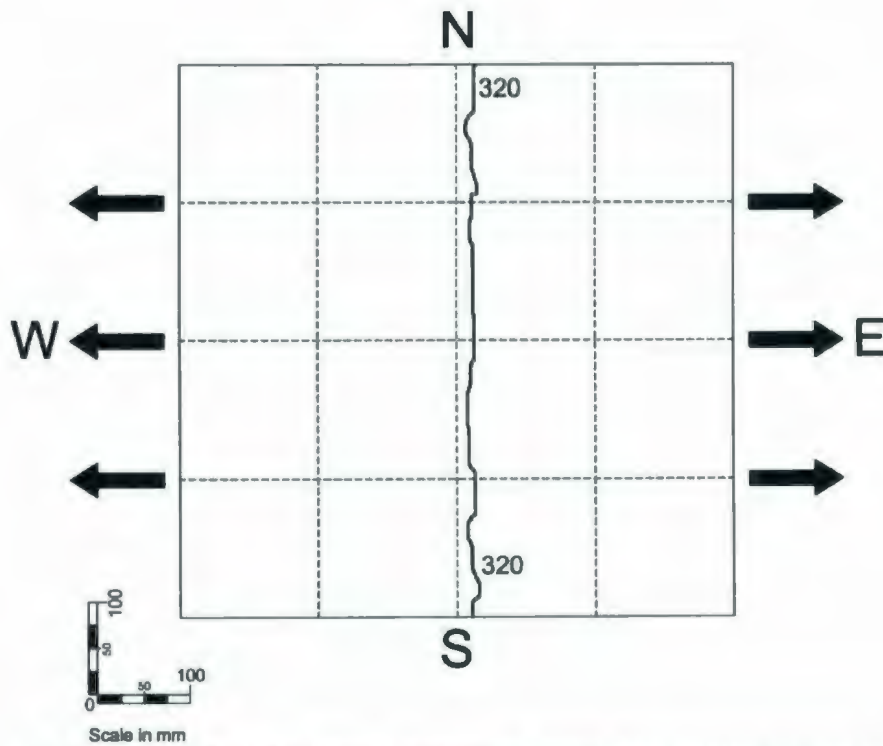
Stabilized crack pattern of panel P11-SNU-16-1.0-2.5
